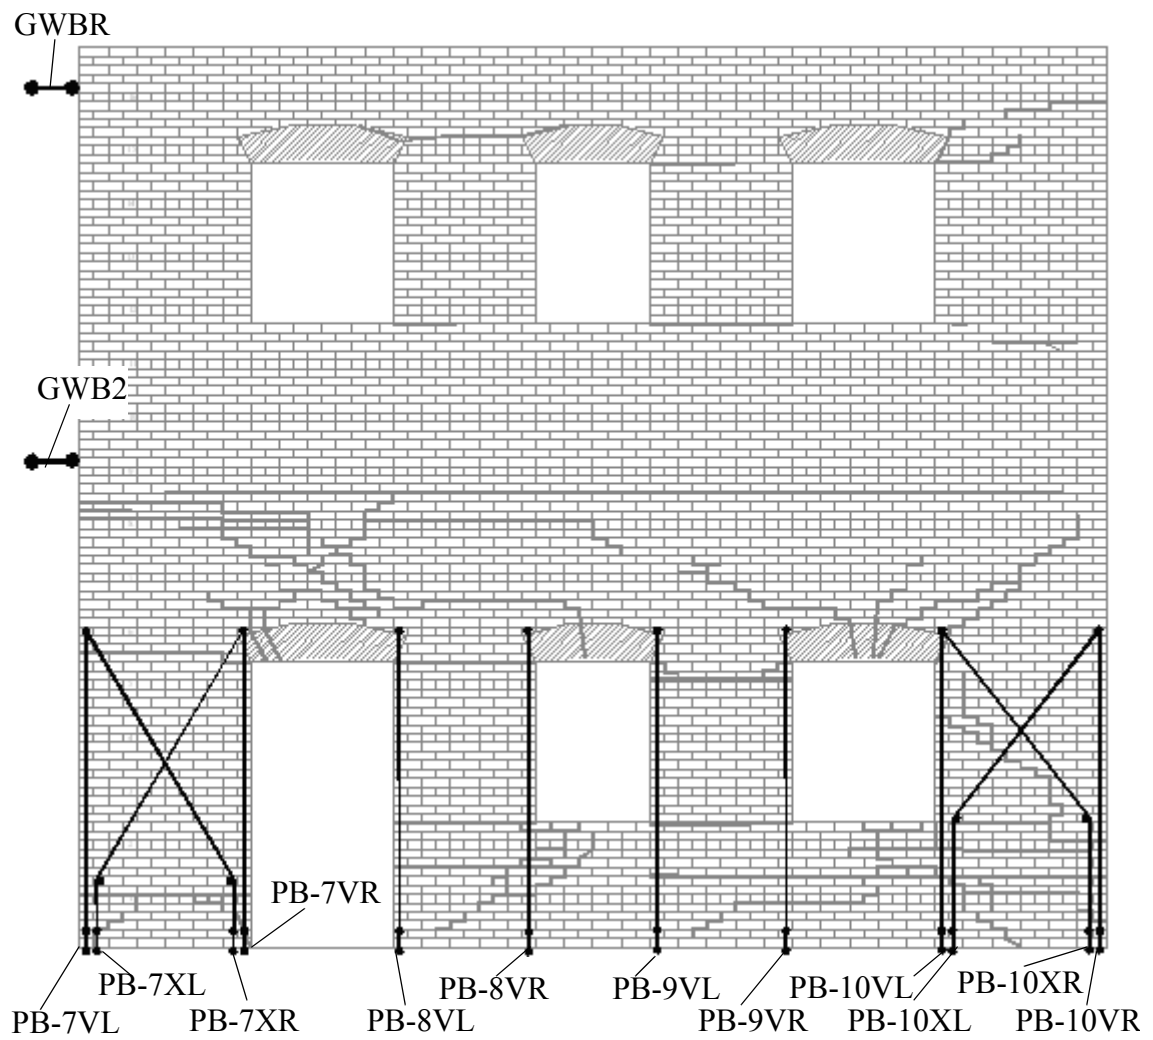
Elevation view of Wall B illustrating the location of LVDTs.
